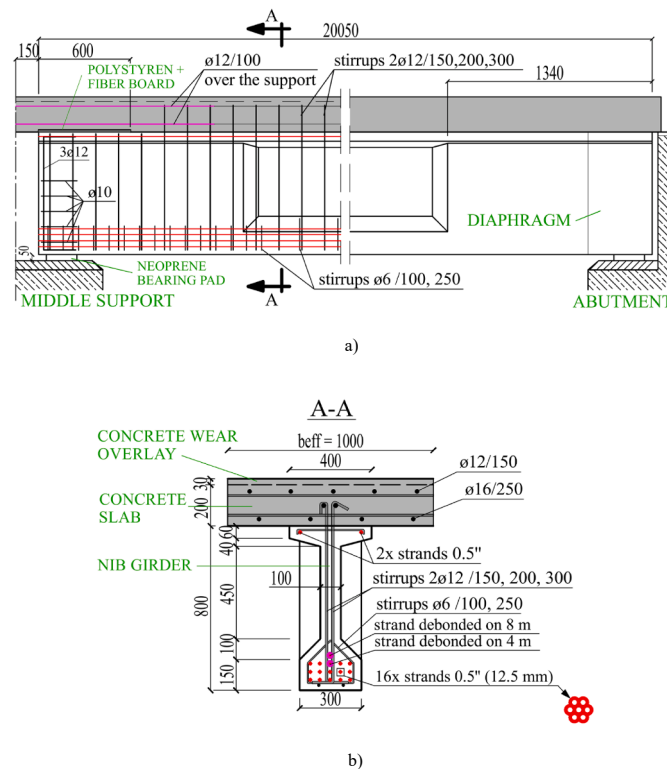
Geometry and reinforcement arrangement in one standard I-shaped pretensioned girder (NIB) and RC slab in Dalselv Bridge, dimensions in mm, a) side view b) cross-section A-A.
